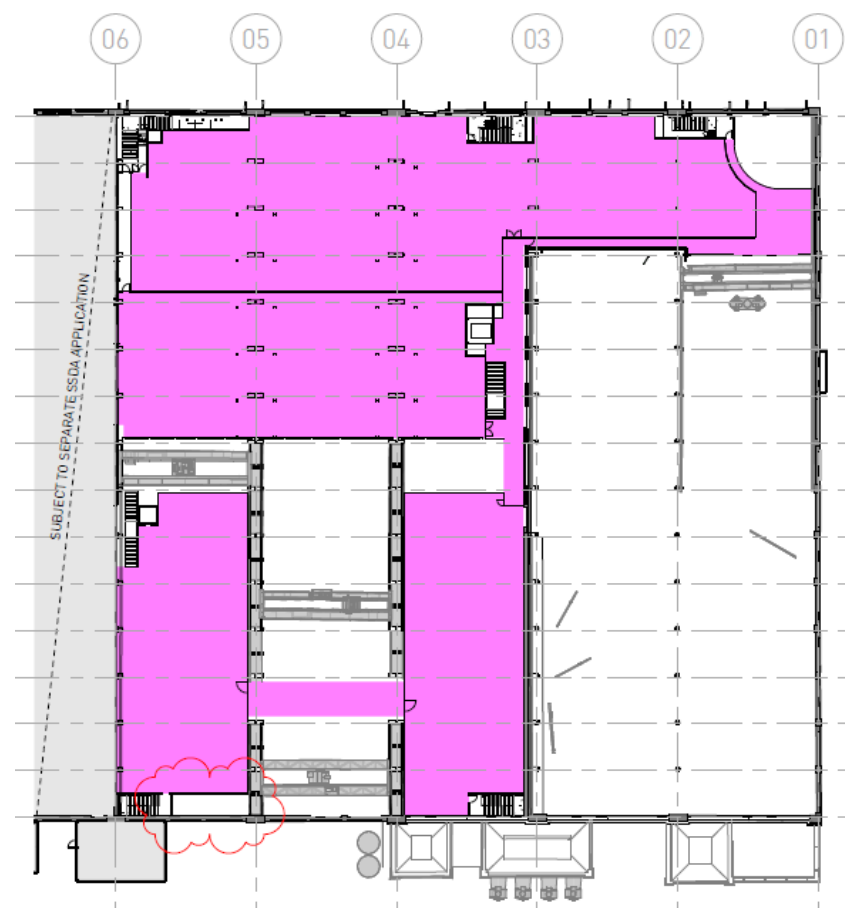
Proposed Level 1 GFA Plan (Source: Sissons, 2019)
